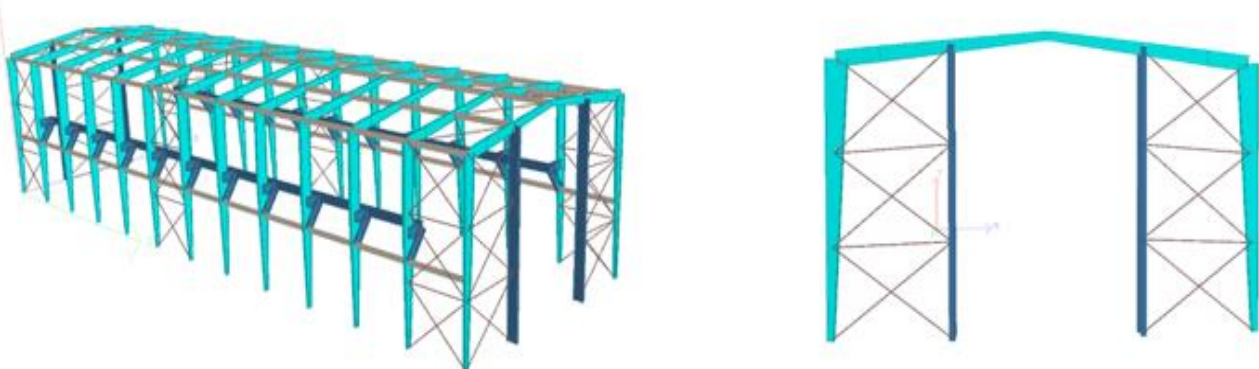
Pre -Engineered Buildings (PEB)structure modeling as per staad file
